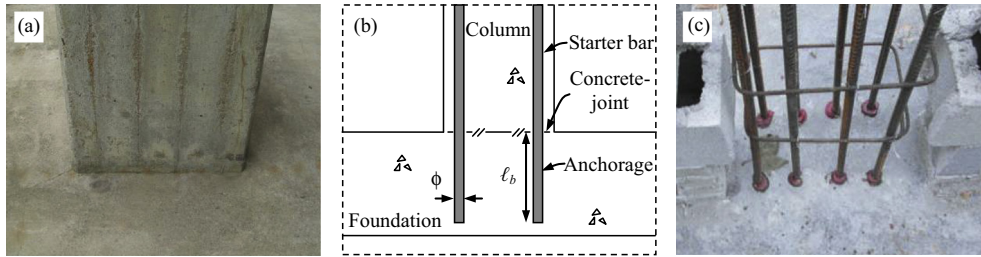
Column-to-foundation connection: (a) with cast-in starter bars (after concreting); (b) scheme; (c) with post-installed starter bars (before concreting).
